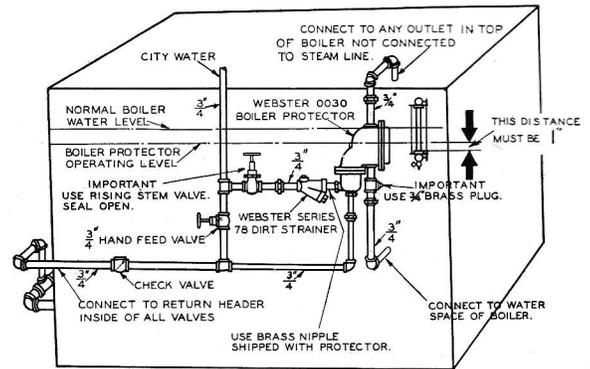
Standard installation of size 0030 Webster Boiler Protector on Rectangular cast iron boiler. For special conditions and for size 030 see Webster Service Details.
